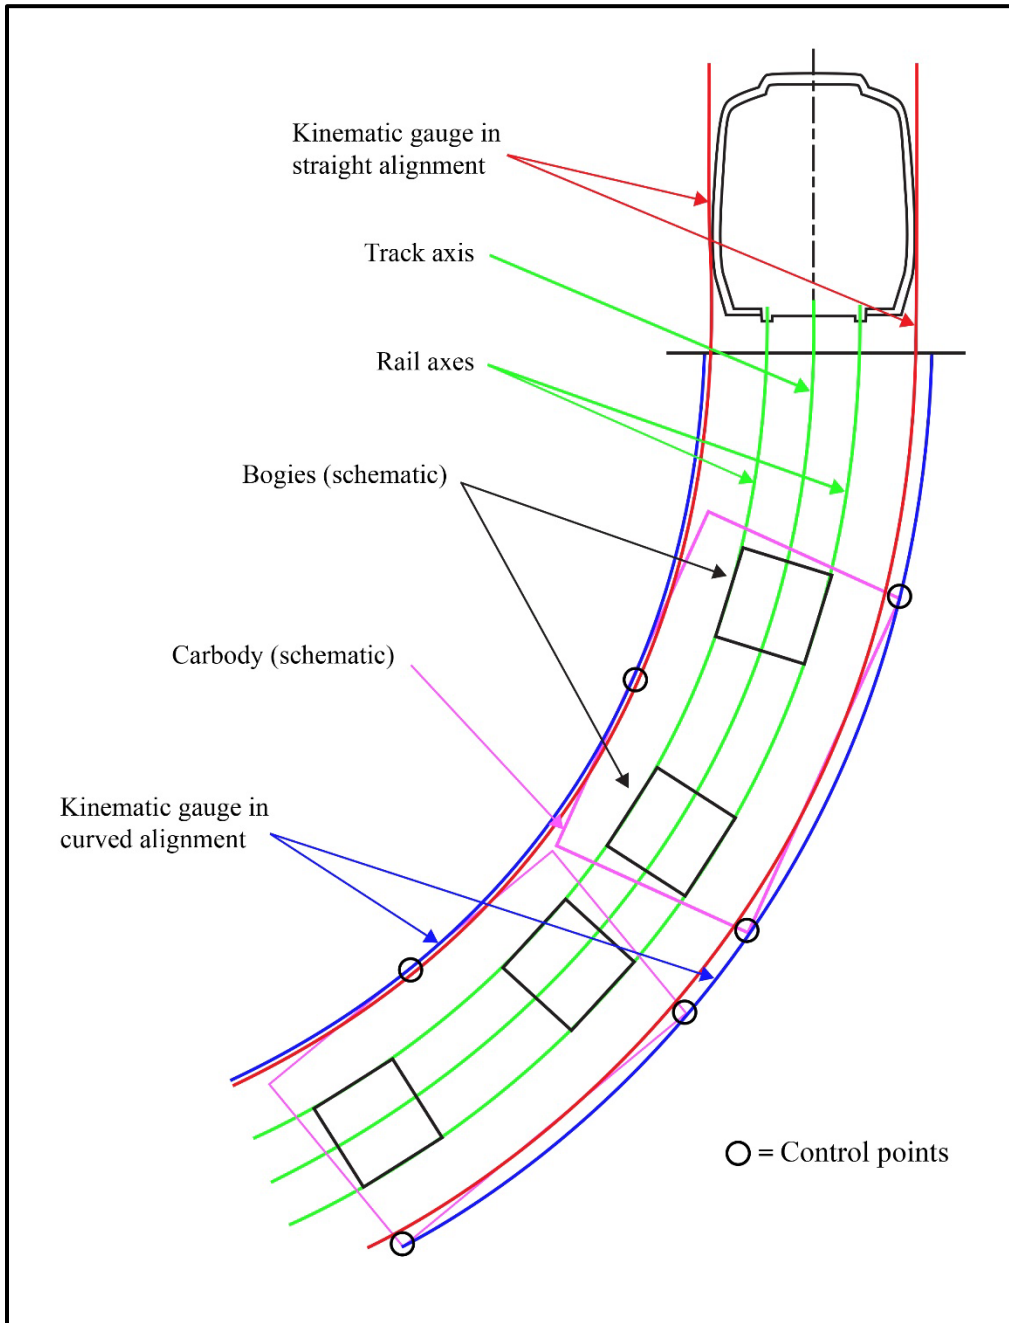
Plan and Section Schematic Showing Impact of Kinematic Envelope on Width Between Parapets (Photo Courtesy of SYSTRA IBT)
